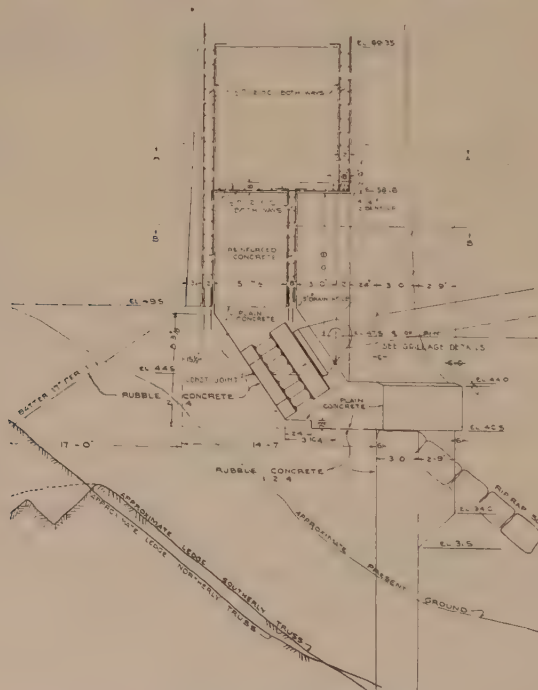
SECTION THROUGH WESTERLY PIER,
